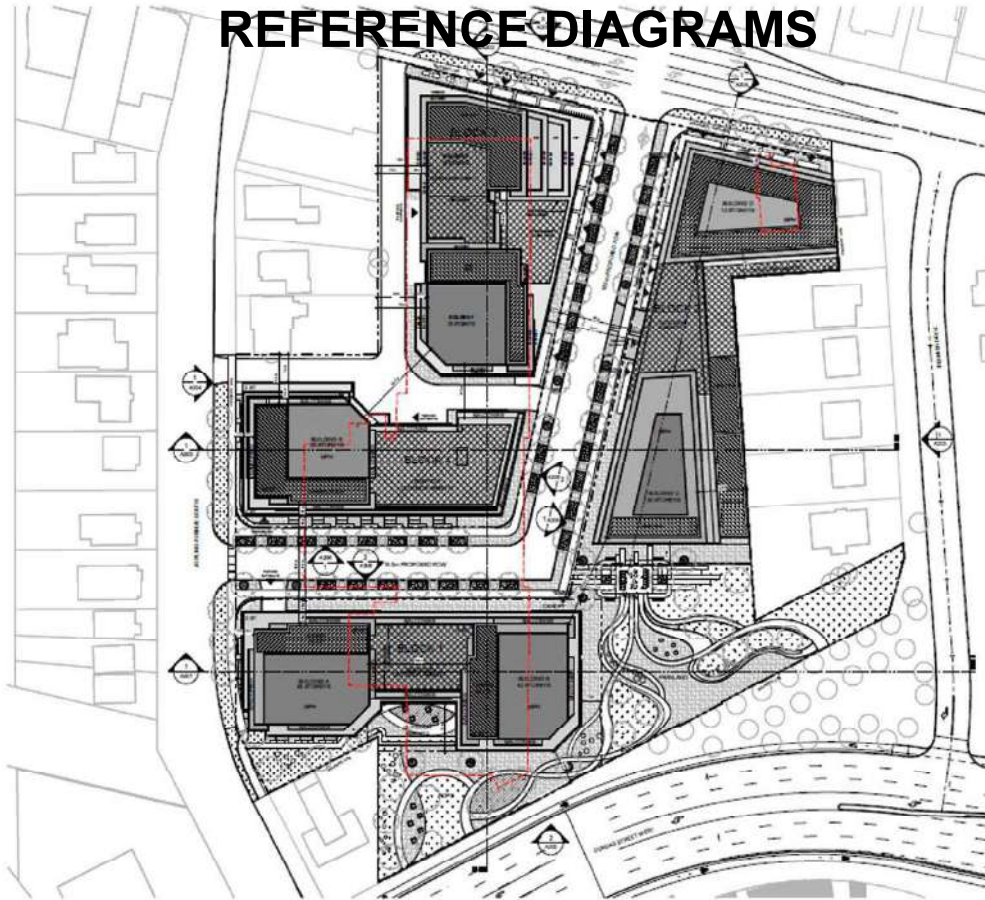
Site Plan, illustrating overall built form and towers orientation across the development site, prepared by IBI Architects
